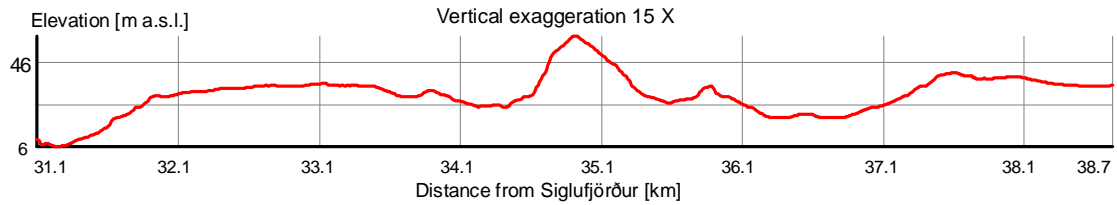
Vertical section of road section 941: km 31.1-38.7 – pipe 510 to crossroads to Straumnes
